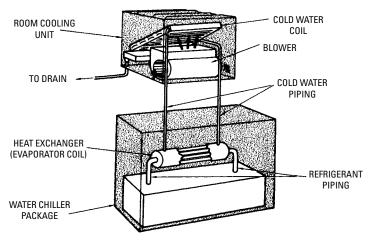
Evaporator coil. (Courtesy Coleman Co.)
